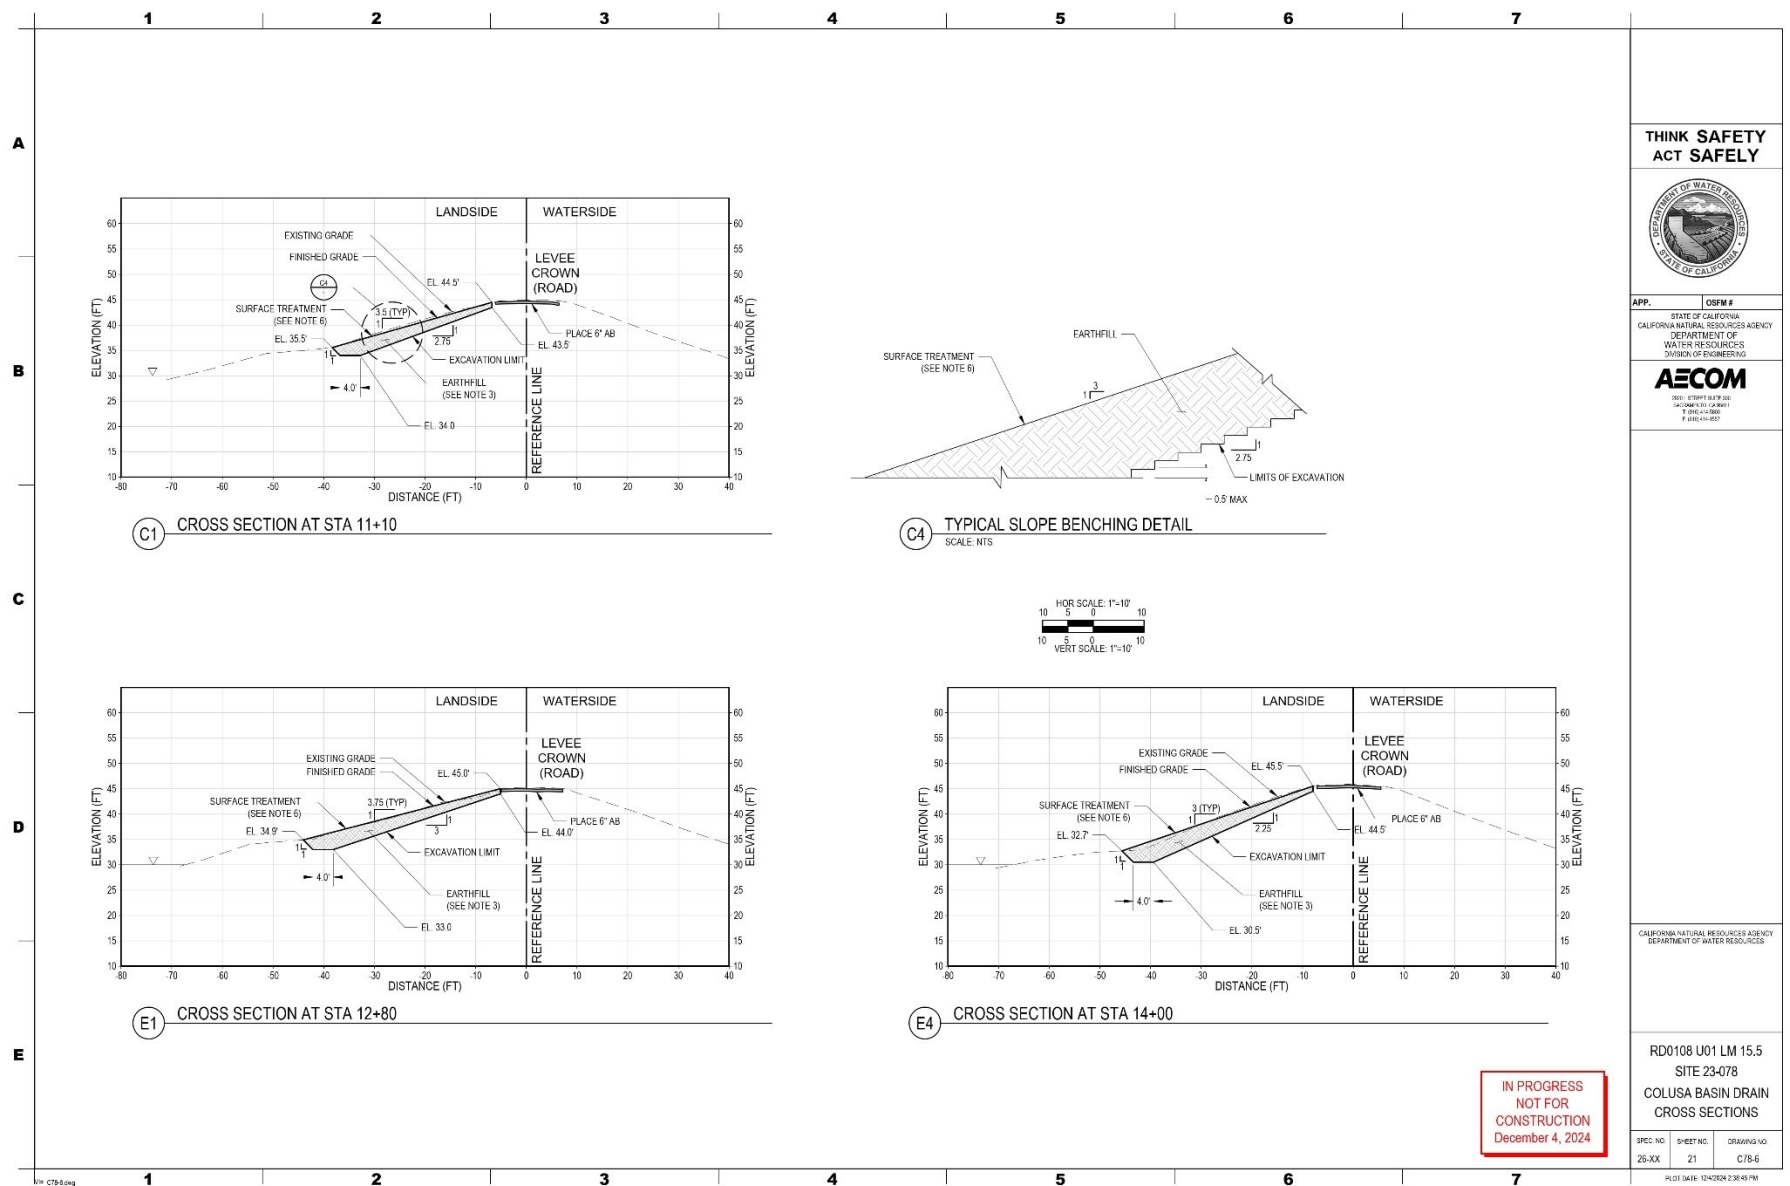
Cross-Sections of the Repairs at Site 23-078
